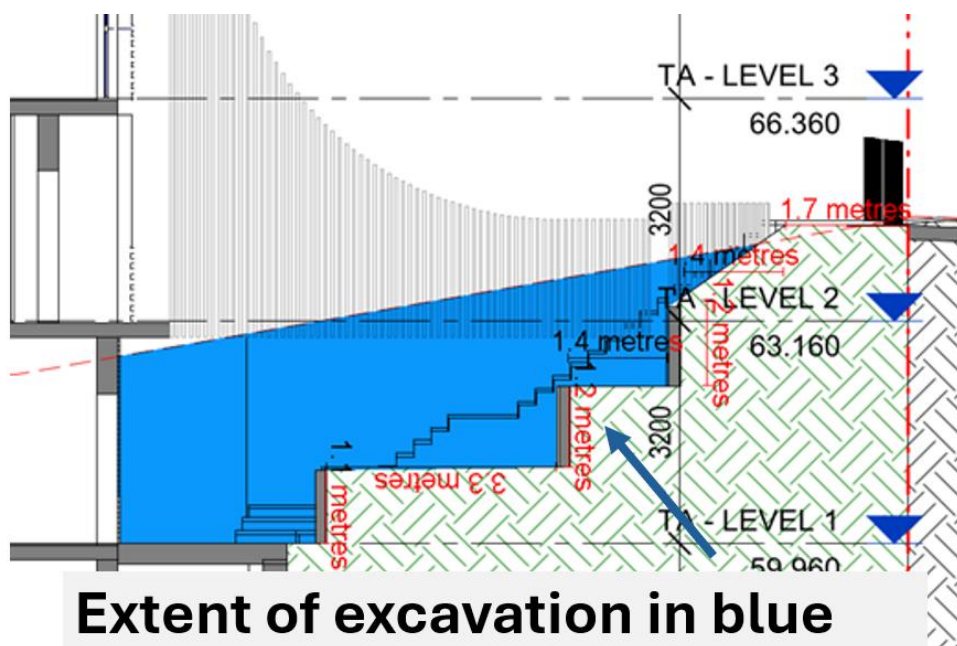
Austin Street Setback - + 3.5m excavation - additional wall required to resolve level change at lot boundary Plan shows only one small area of planting which is 3m W - otherwise widths are less than 2.2m (Source: Council's Landscape Officer)
